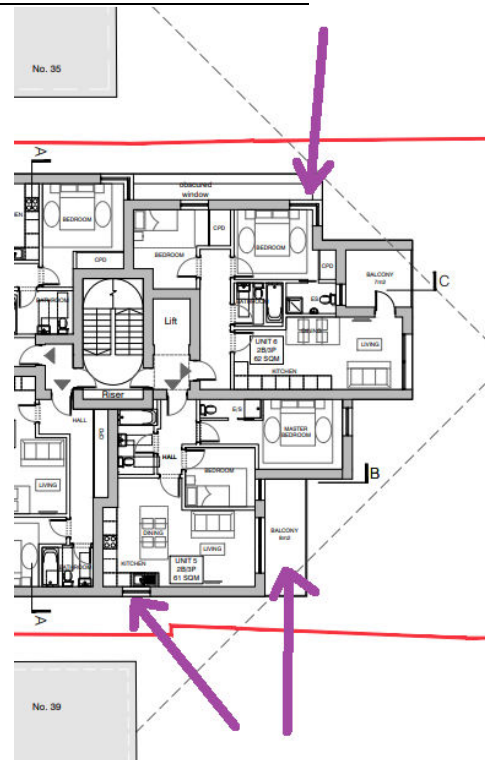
Application First Floor Plan, showing side windows and balconies.
